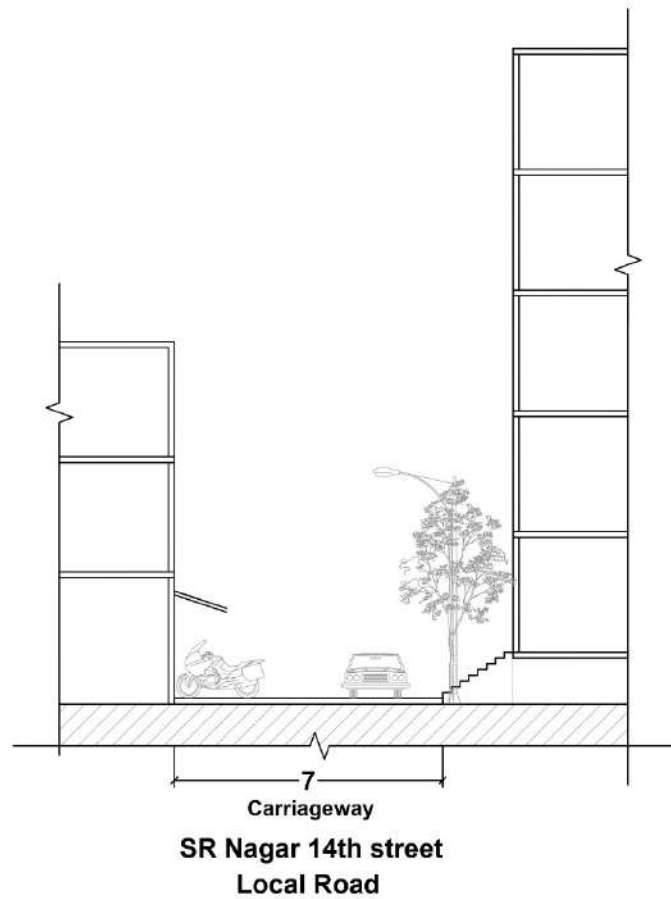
Cross section of SR Nagar 14th street (I - I')
